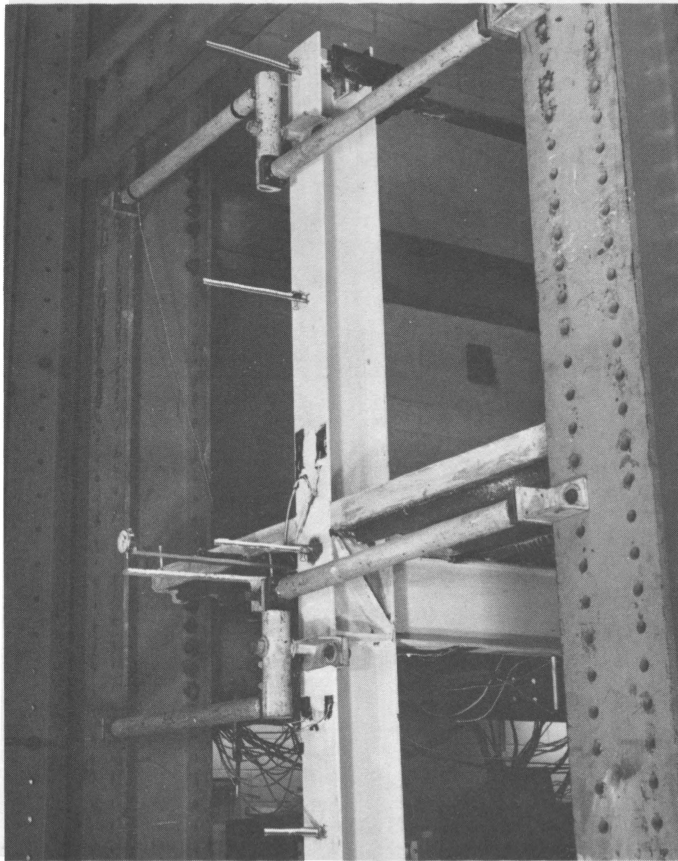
View of West End of CA-2 Showing Scales for Deflection Readings and Column Bracing (Ref. 9)
